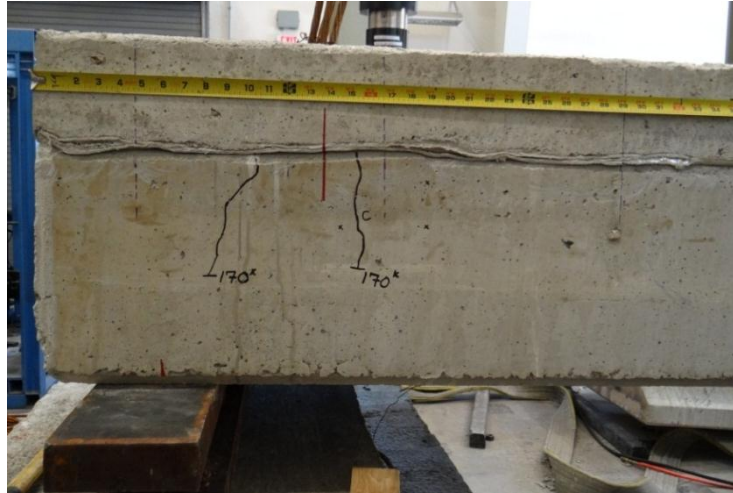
Vertical cracks close to beam ends (North-East side)
